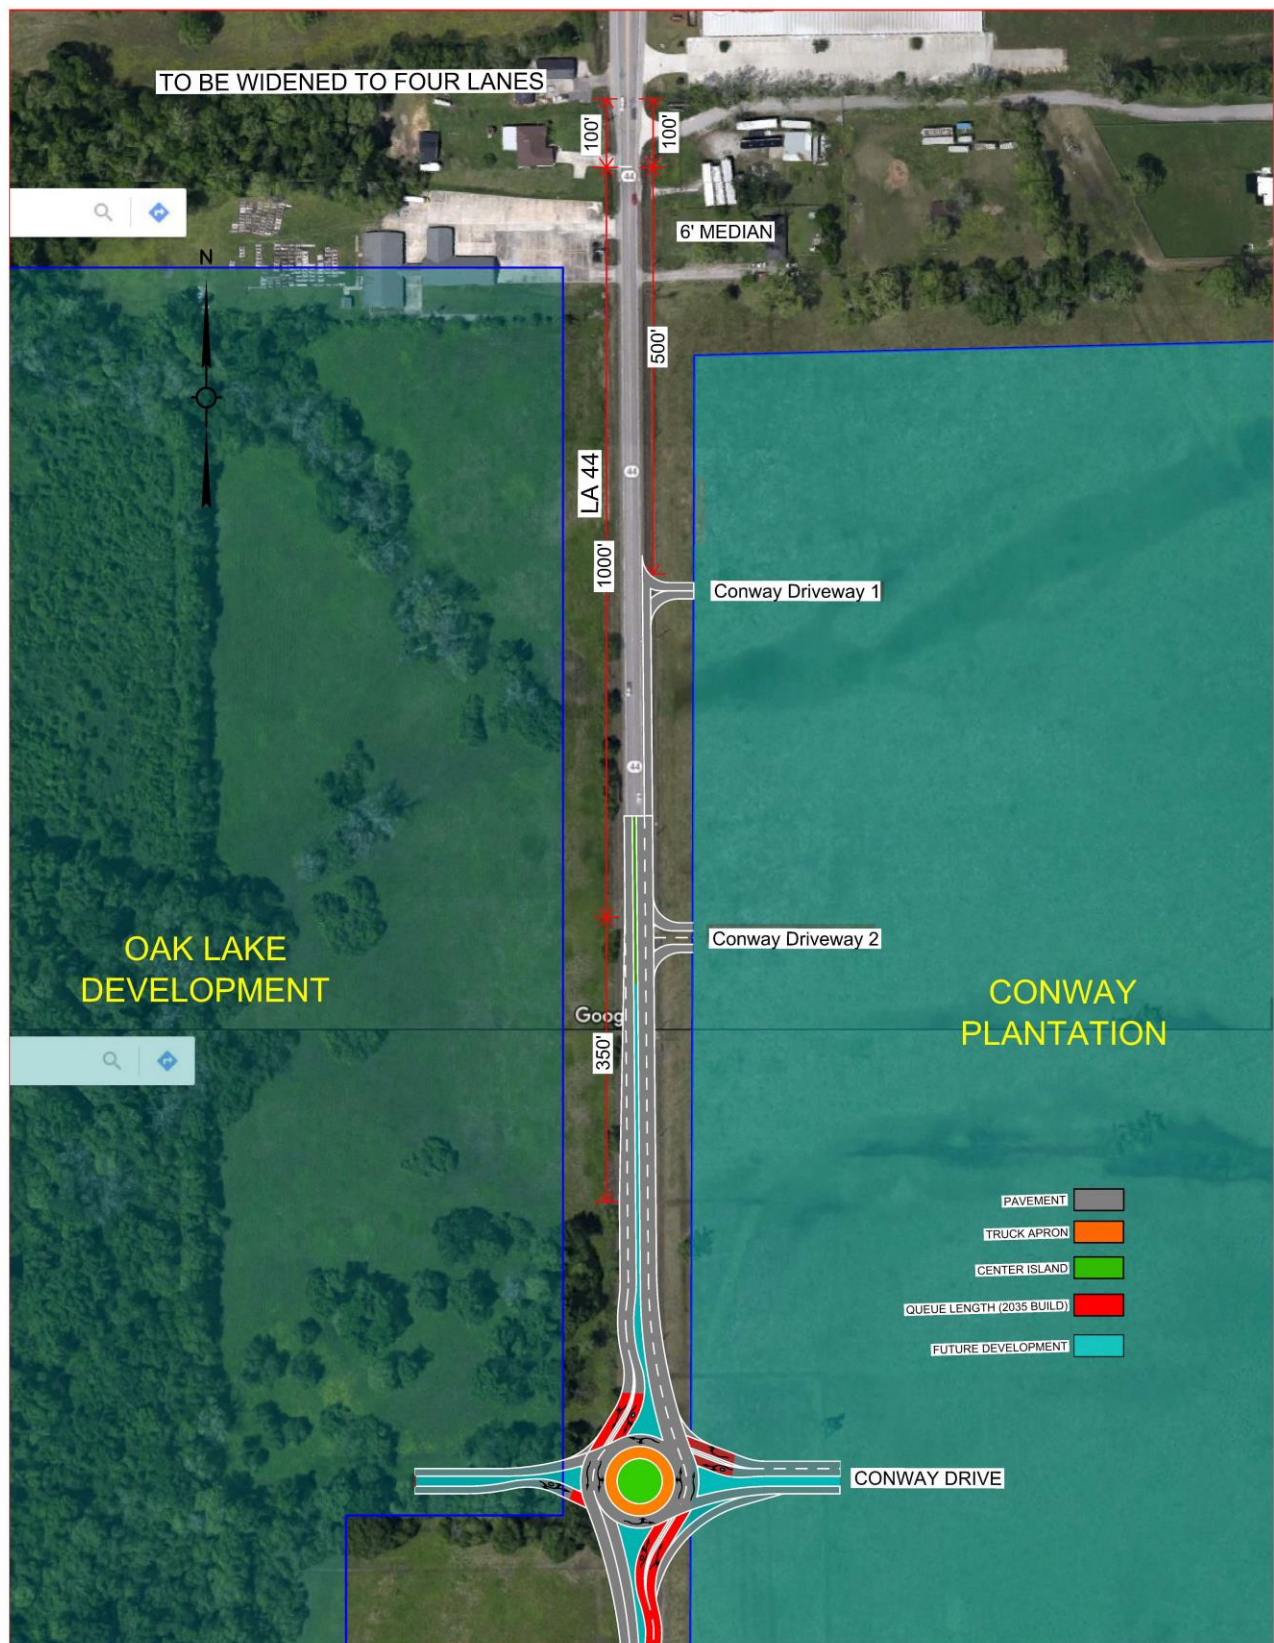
Proposed widening of LA 44. Also shown is the currently planned roundabout at Conway Drive (bottom of photo).
